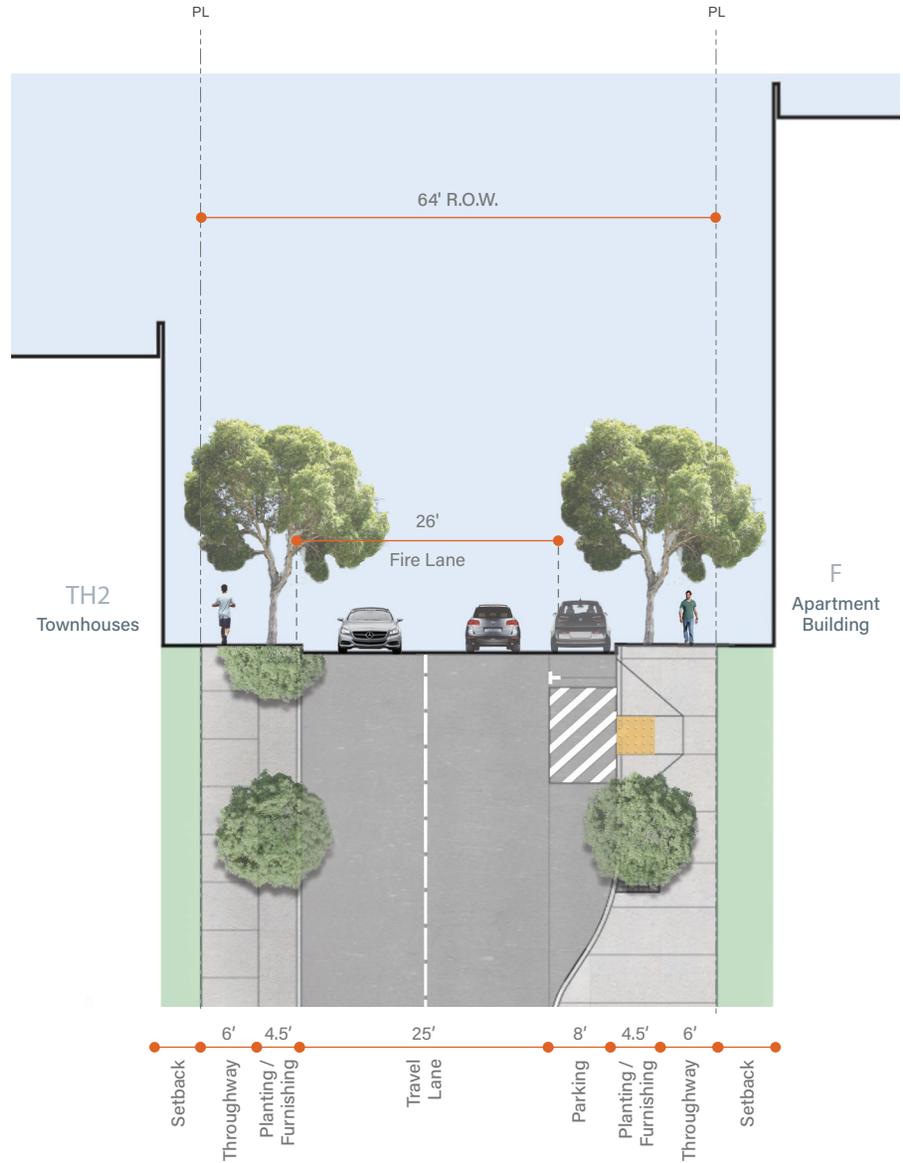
West Street, Section 1 *see "Figure 5.15-2: West Street, Site Plan W.1 & W.2".
